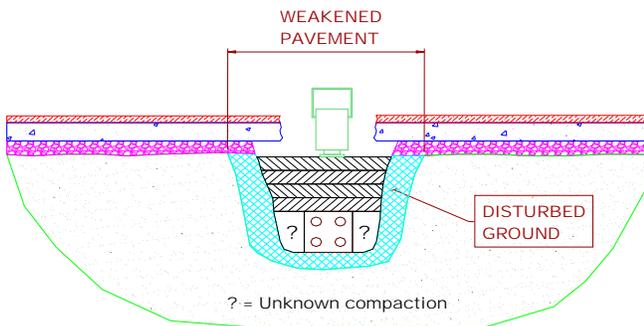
Excavation with planned sawcut<sup>1</sup>
